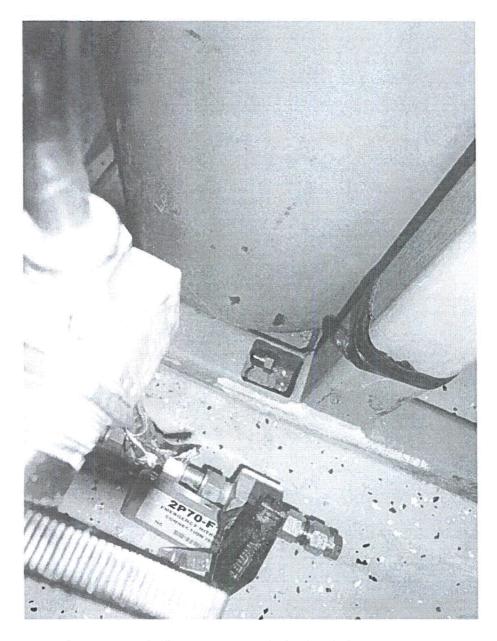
Threaded Fastener Located in Anchor Bolt Recess of Rack
